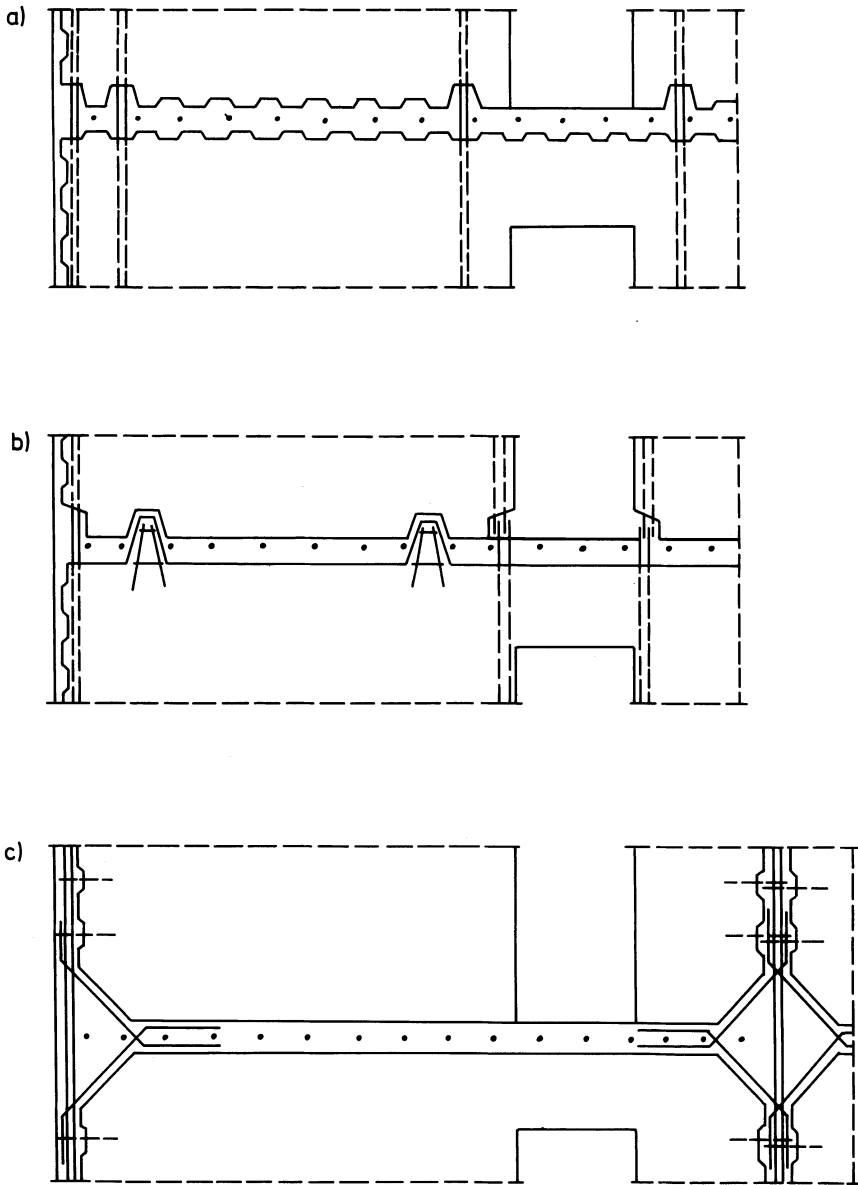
Joints in walls partially under tension, a. keyed horizontal joint; b. with reinforced individual keys, projected from the lower panel; c. with monolithic keys, produced by cutting the corners of the wall panels
